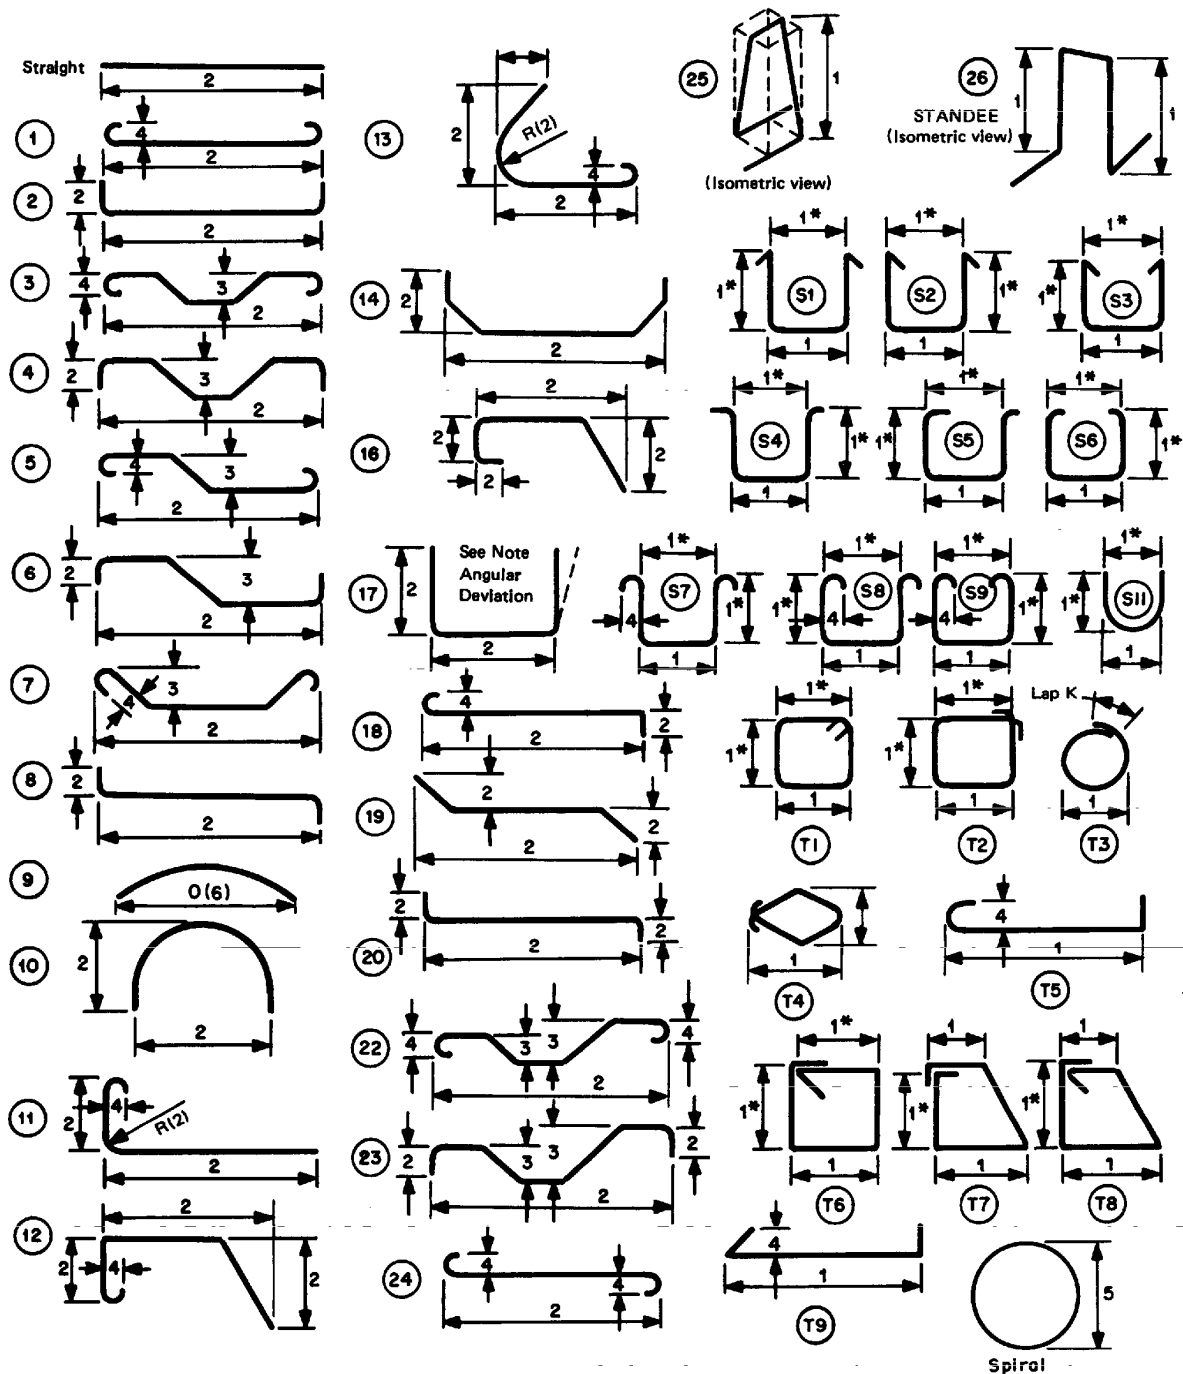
STANDARD FABRICATING TOLERANCES FOR BAR SIZES #3 THROUGH #11
